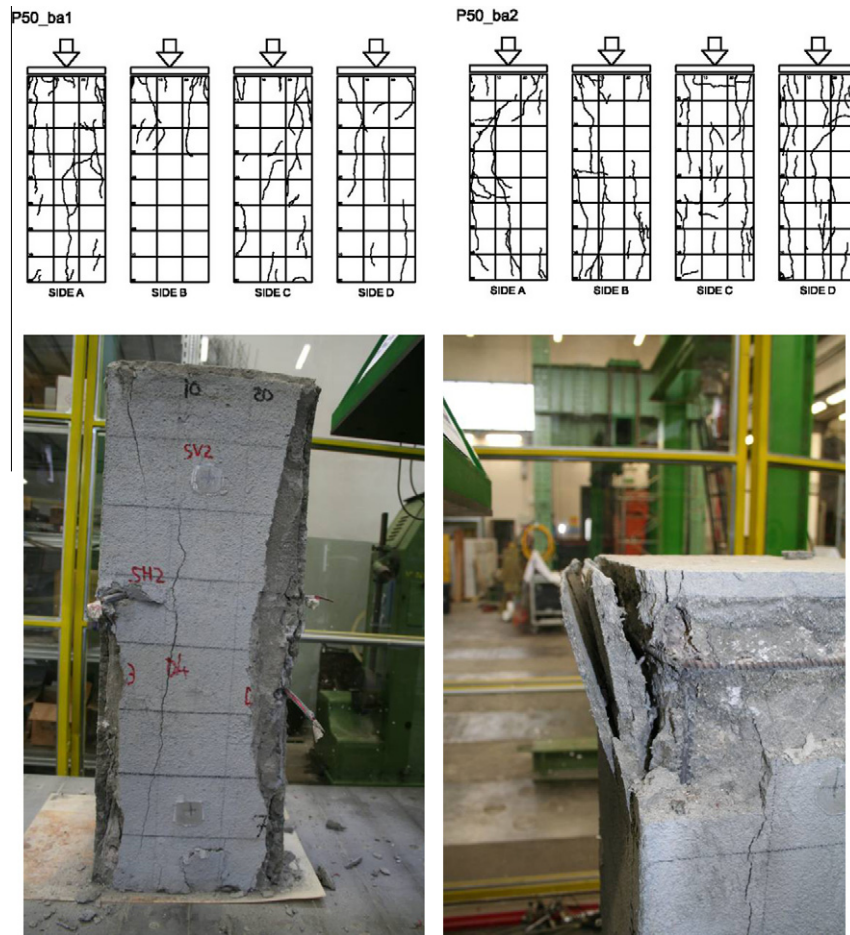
Crack pattern of columns repaired with type *ab* mortar.
